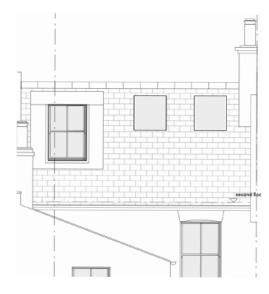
58 Twisden Road Dormer (rear elevation from Planning Application 2020/4939/P)
